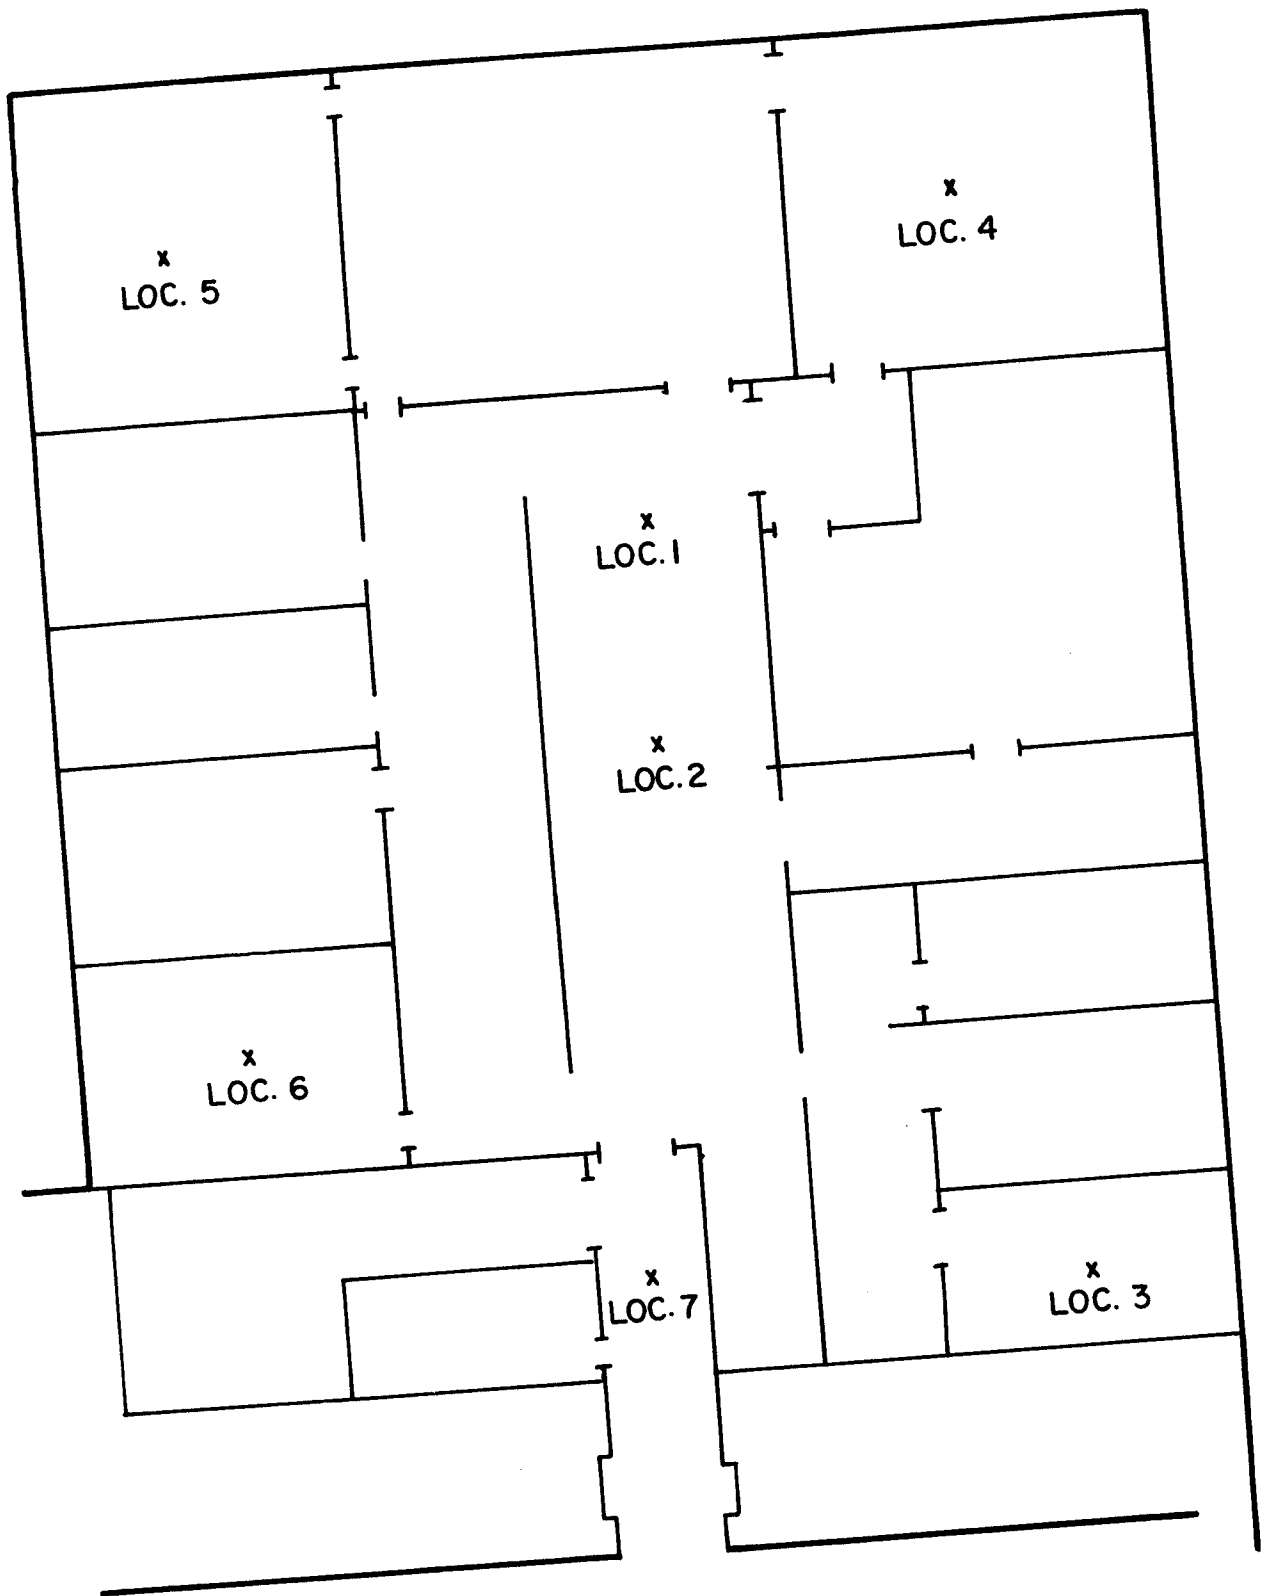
INSTRUMENTATION LAYOUT ON 10th FLOOR - FIRE # 2
